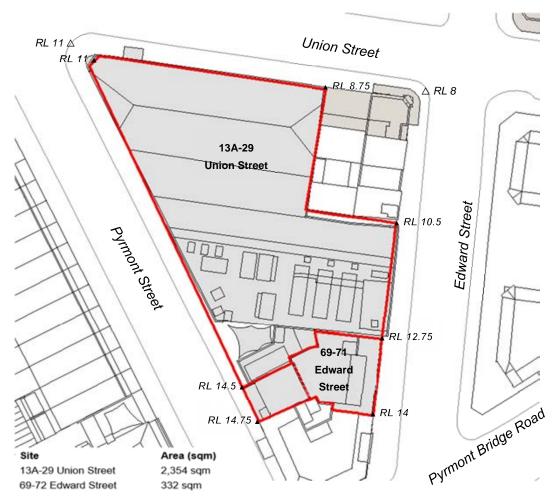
existing site plan for 13A-29 Union Street & 69-72 Edward Street
